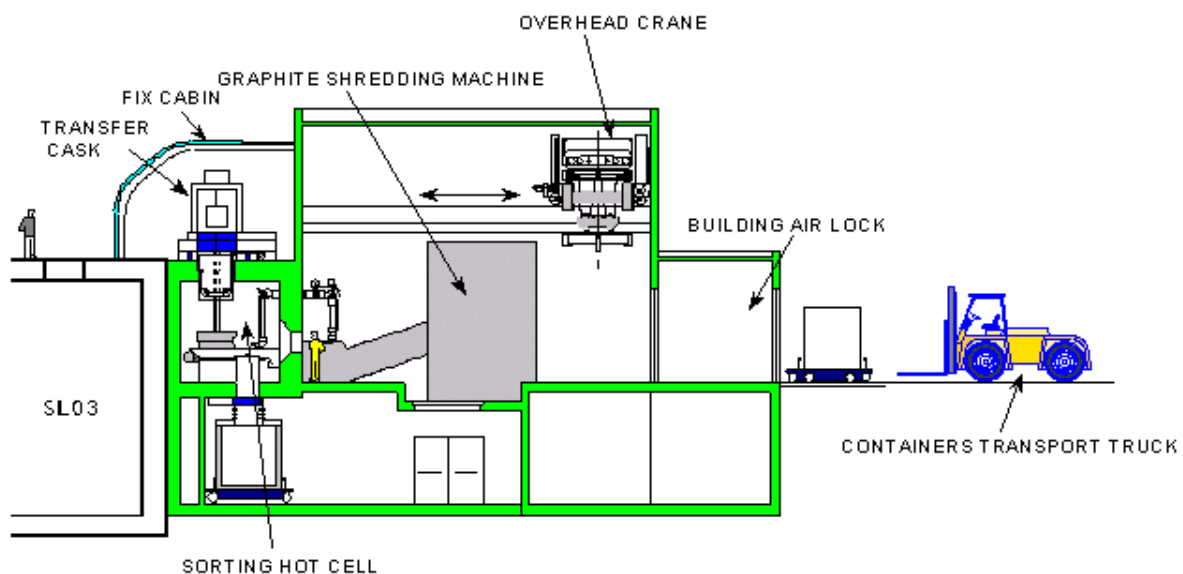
CONDITIONING BUILDING CROSS SECTION
